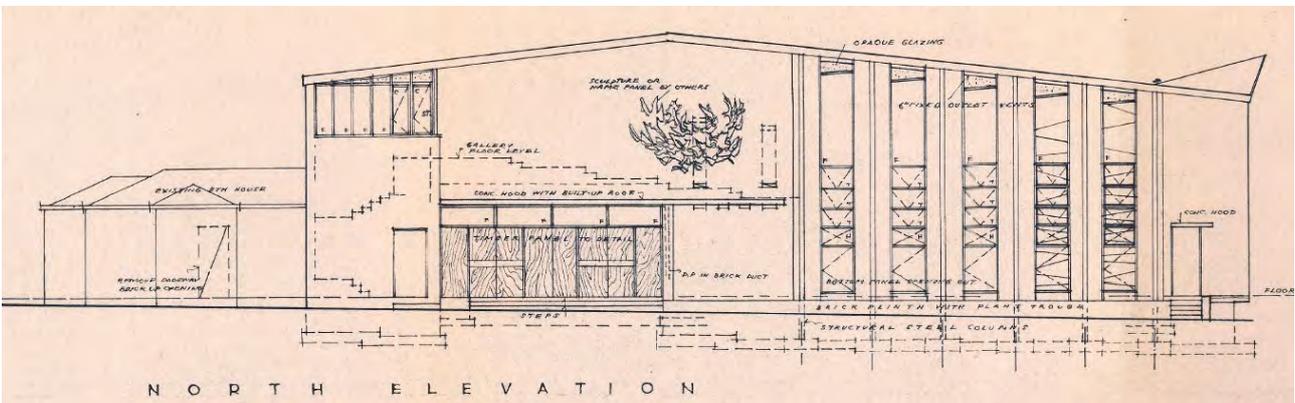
Drawing dated July 1961 (Dr. Ernest Fooks), showing north elevation. (Source: Council Building File)
